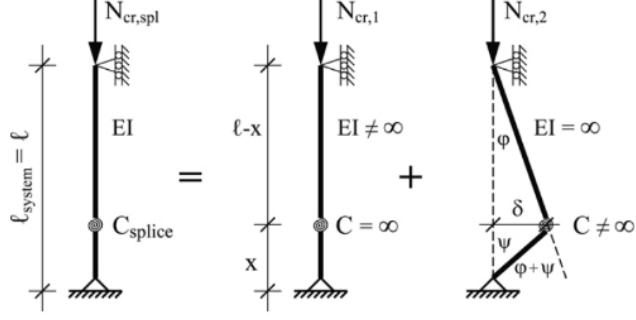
Column model for stiffness requirements of a column splice. [16]
